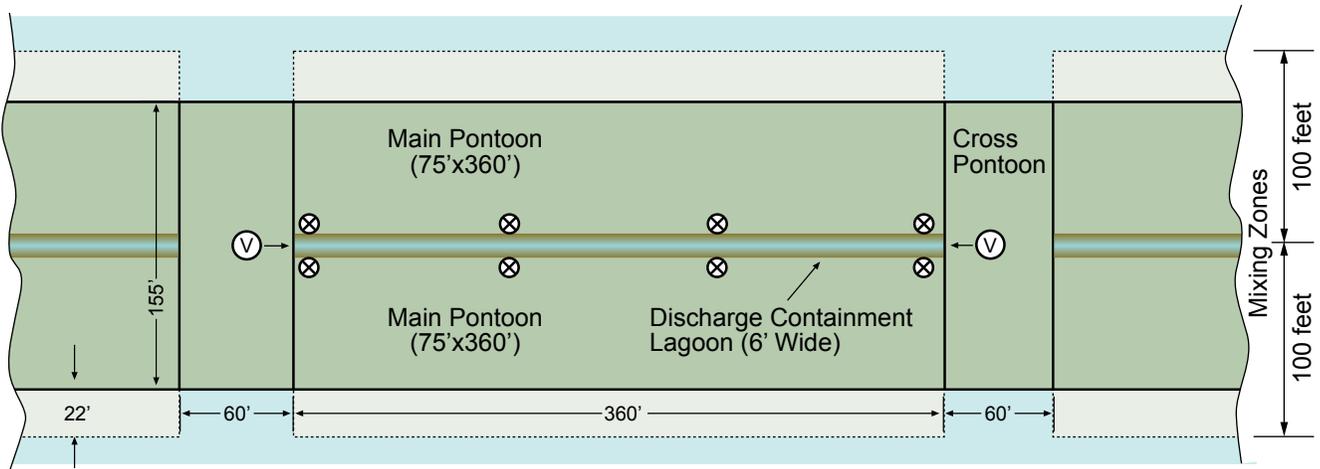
Schematic Section View of Proposed Mixing Zone Boundaries for Build Alternatives
